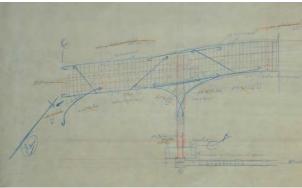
c1927 Part of sketch drawing of the concrete bridge showing the reinforcing. Source: ML photographed
